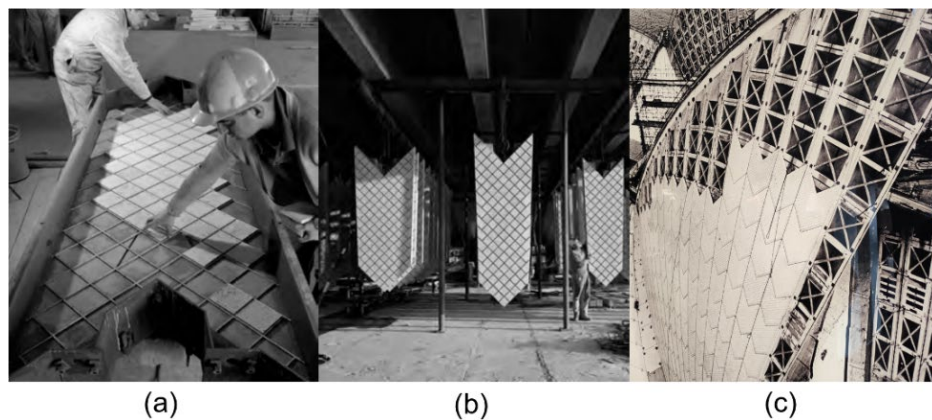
Precast concrete lid in (a) tile assembling process (b) factory
